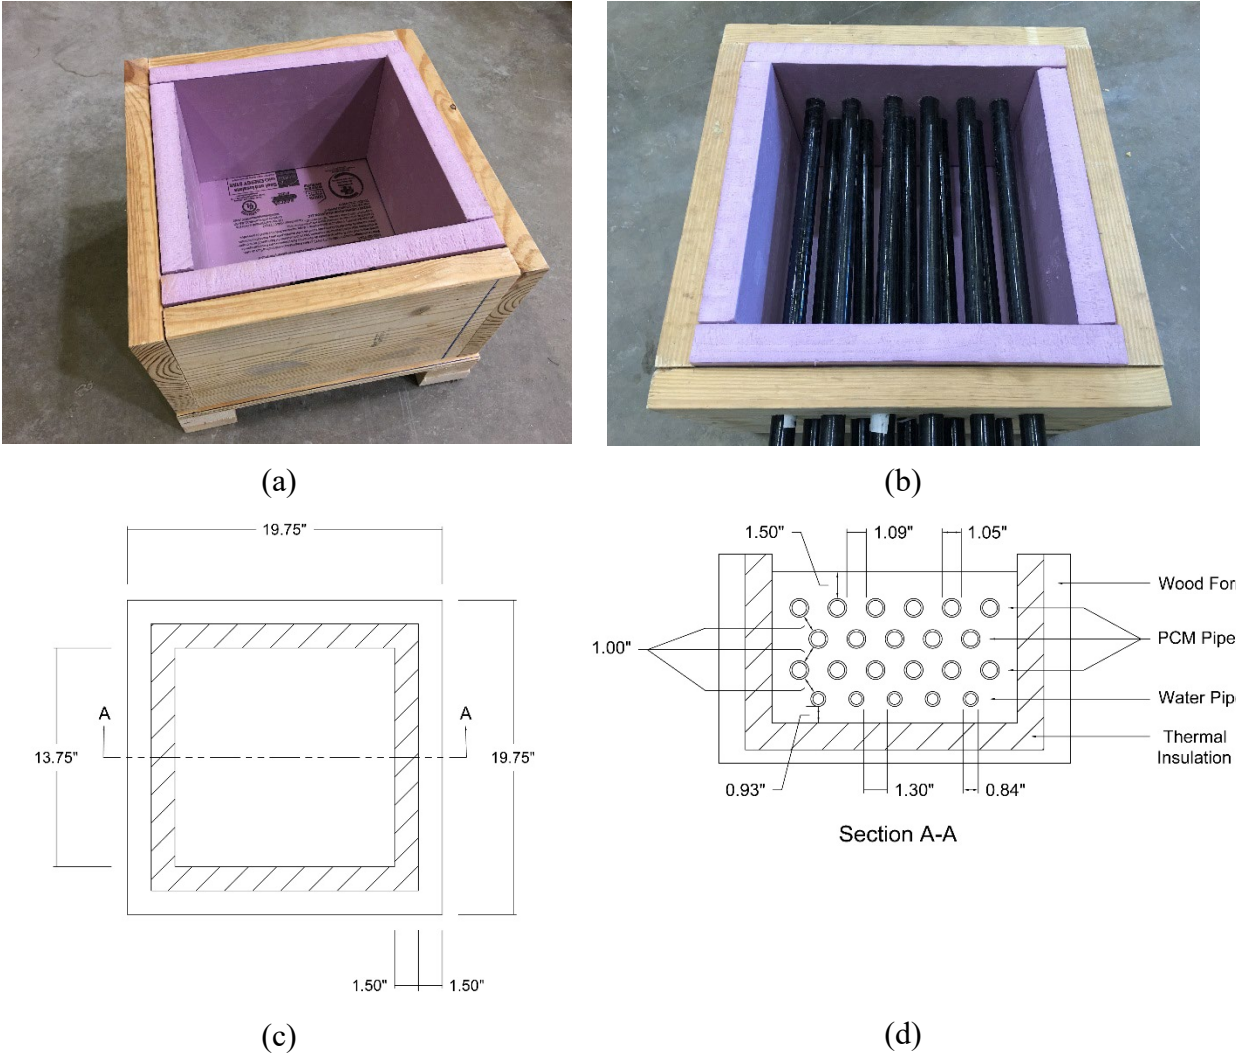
Design Details for the Large-Scale Concrete Slab: (a) Mold with Thermal Insulation, (b) Mold with Embedded Pipes, (c) Top View Details of the Mold and the Concrete Slab, and (d) Cross Section Details of the Mold and the Concrete Slab Containing Embedded Pipes
